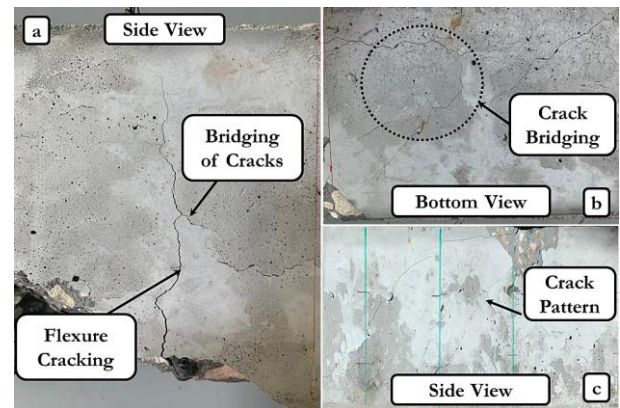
Experimental evidence of cracking (a) Cross-sectional view (b) bottom view (c) side view
